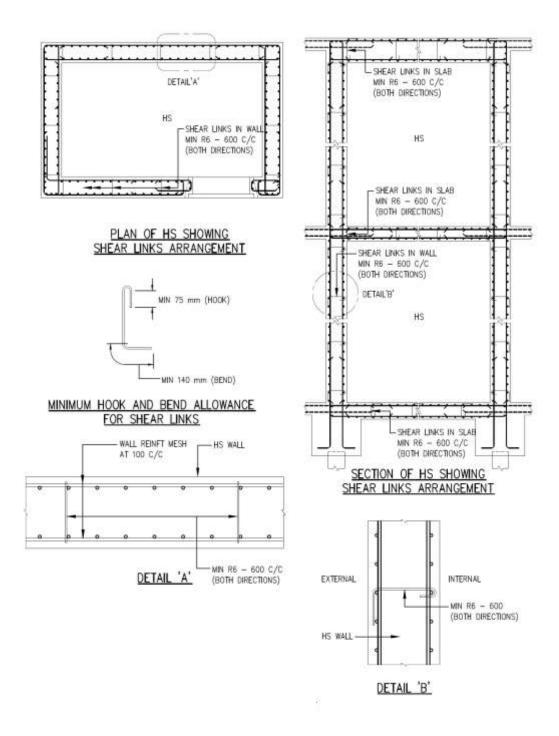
SHEAR LINKS DETAILS FOR for HS, SS and SSS WALL AND SLAB
